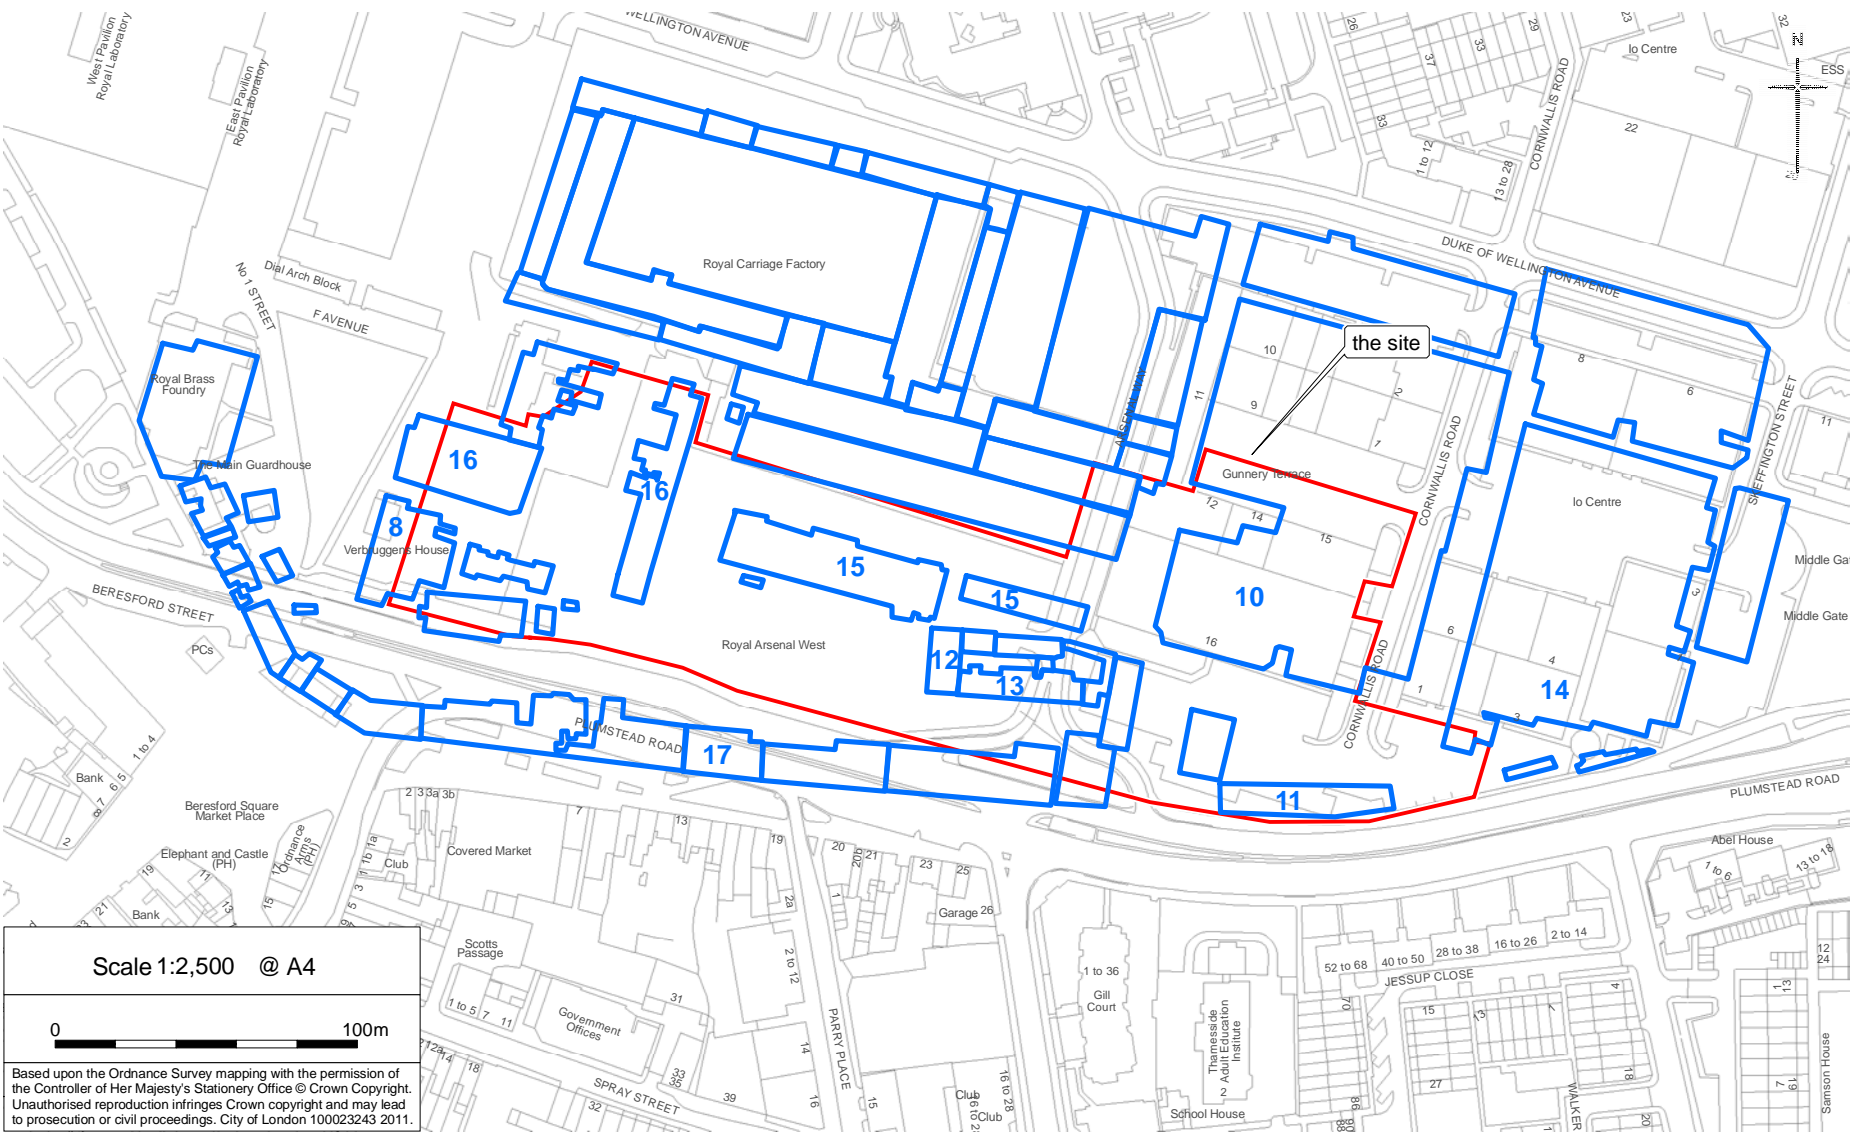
Schematic plan of the site with buildings shown on 1930s plan (see table 2)
